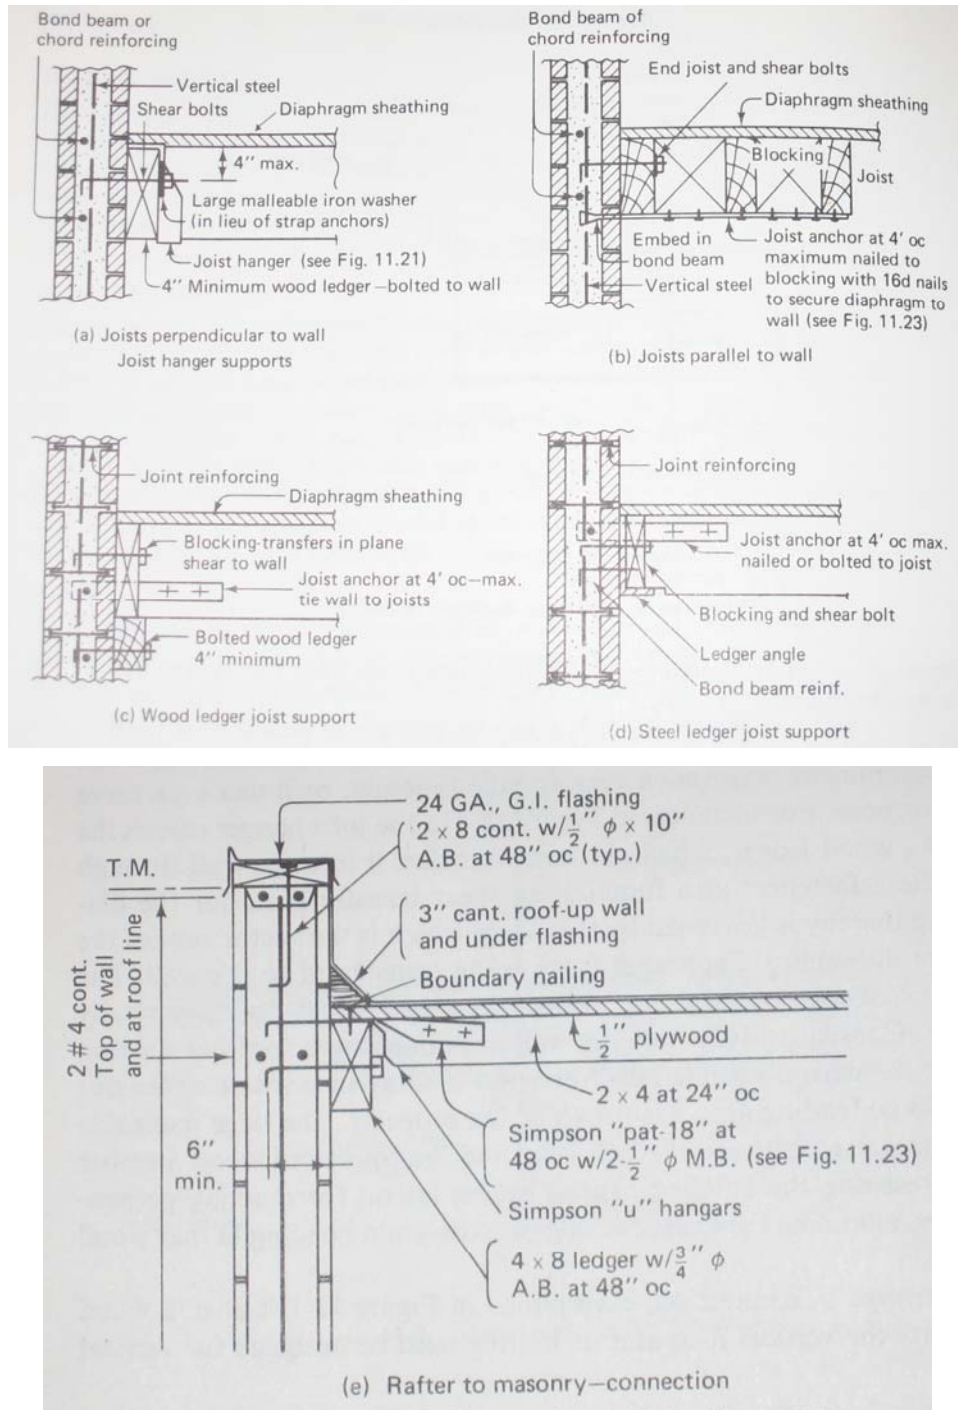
Bolted connections – timber to masonry (Courtesy: ref 24)
